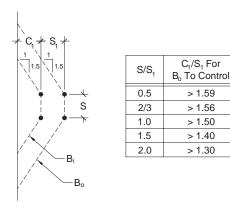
Concrete Breakout Surfaces for Group Anchors
